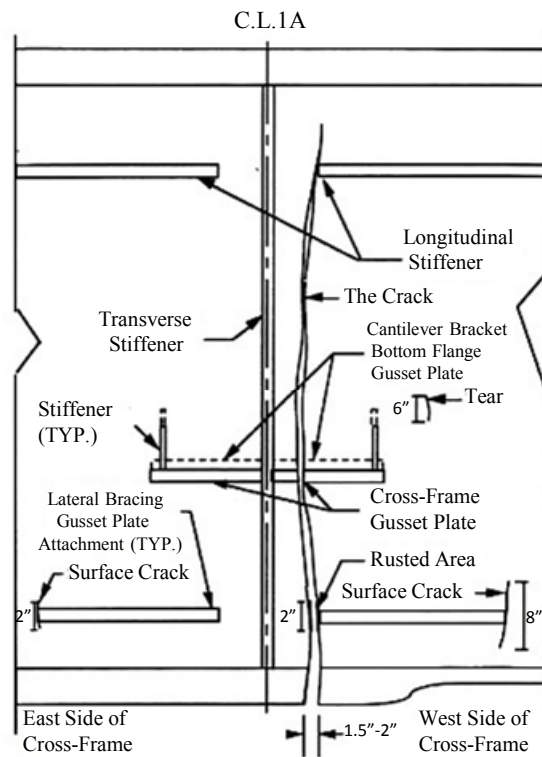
Holston River Bridge girder-cracked section (Deatherage et al. 1996)
